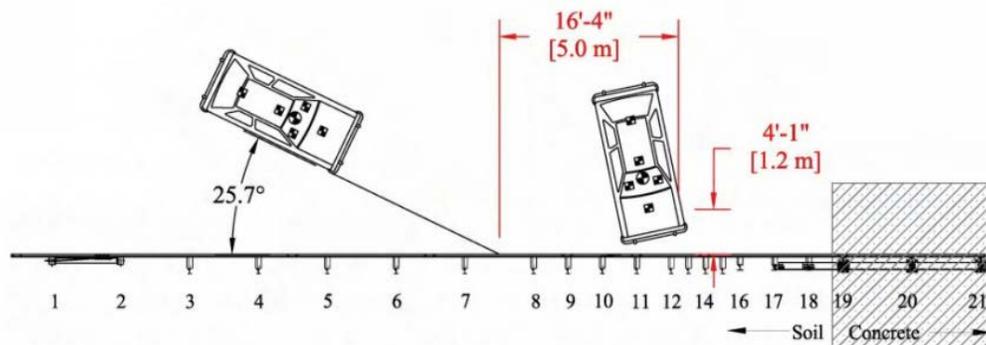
Test Impact Drawings for Test No. MWTSP-3.
